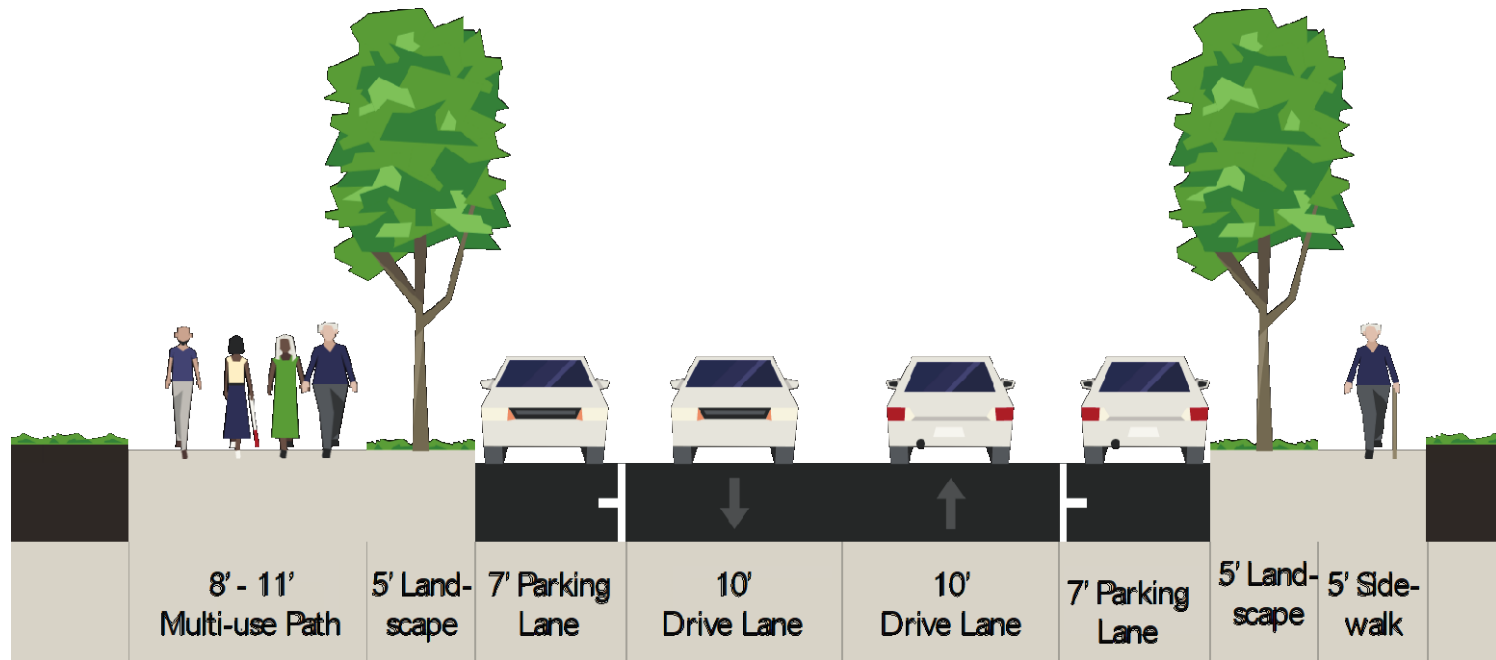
Thomson Avenue Cross Section (60-foot Right-of-Way)
